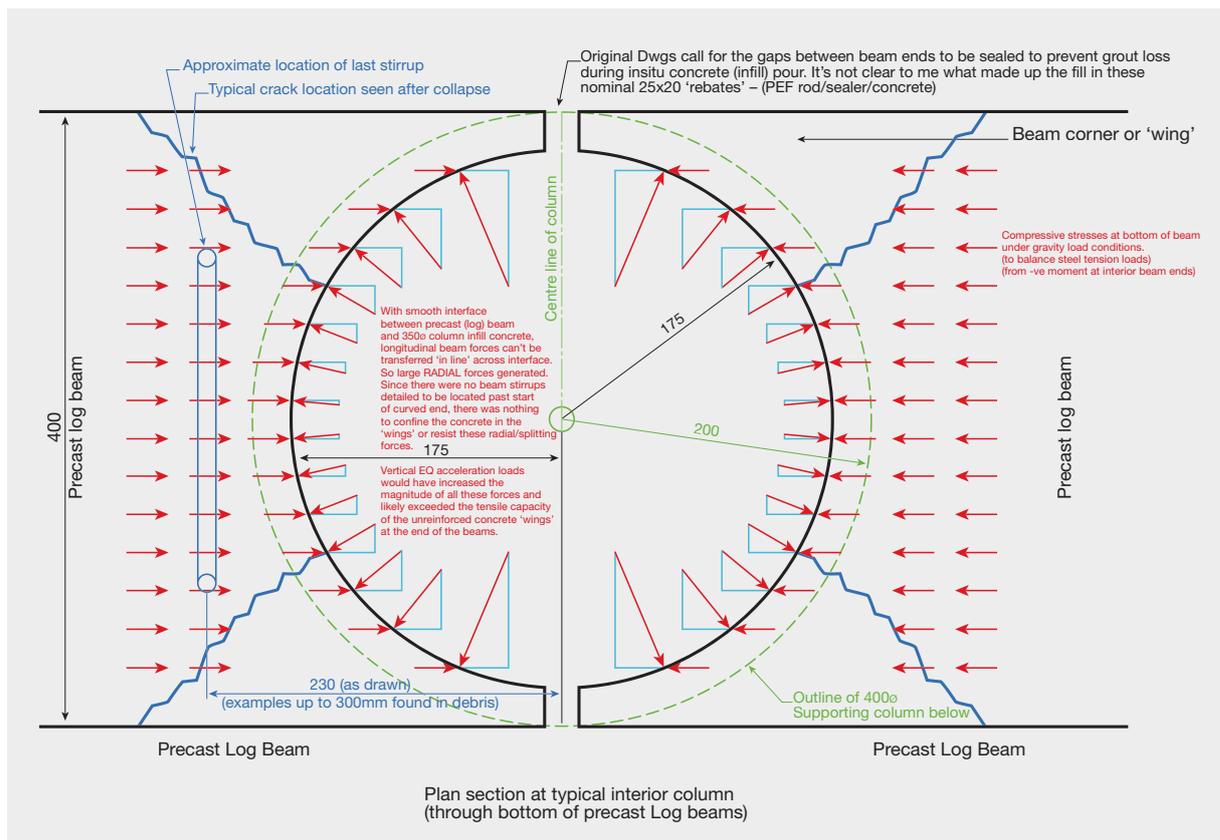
Plan view of beam-column joint prepared by Graham Frost
